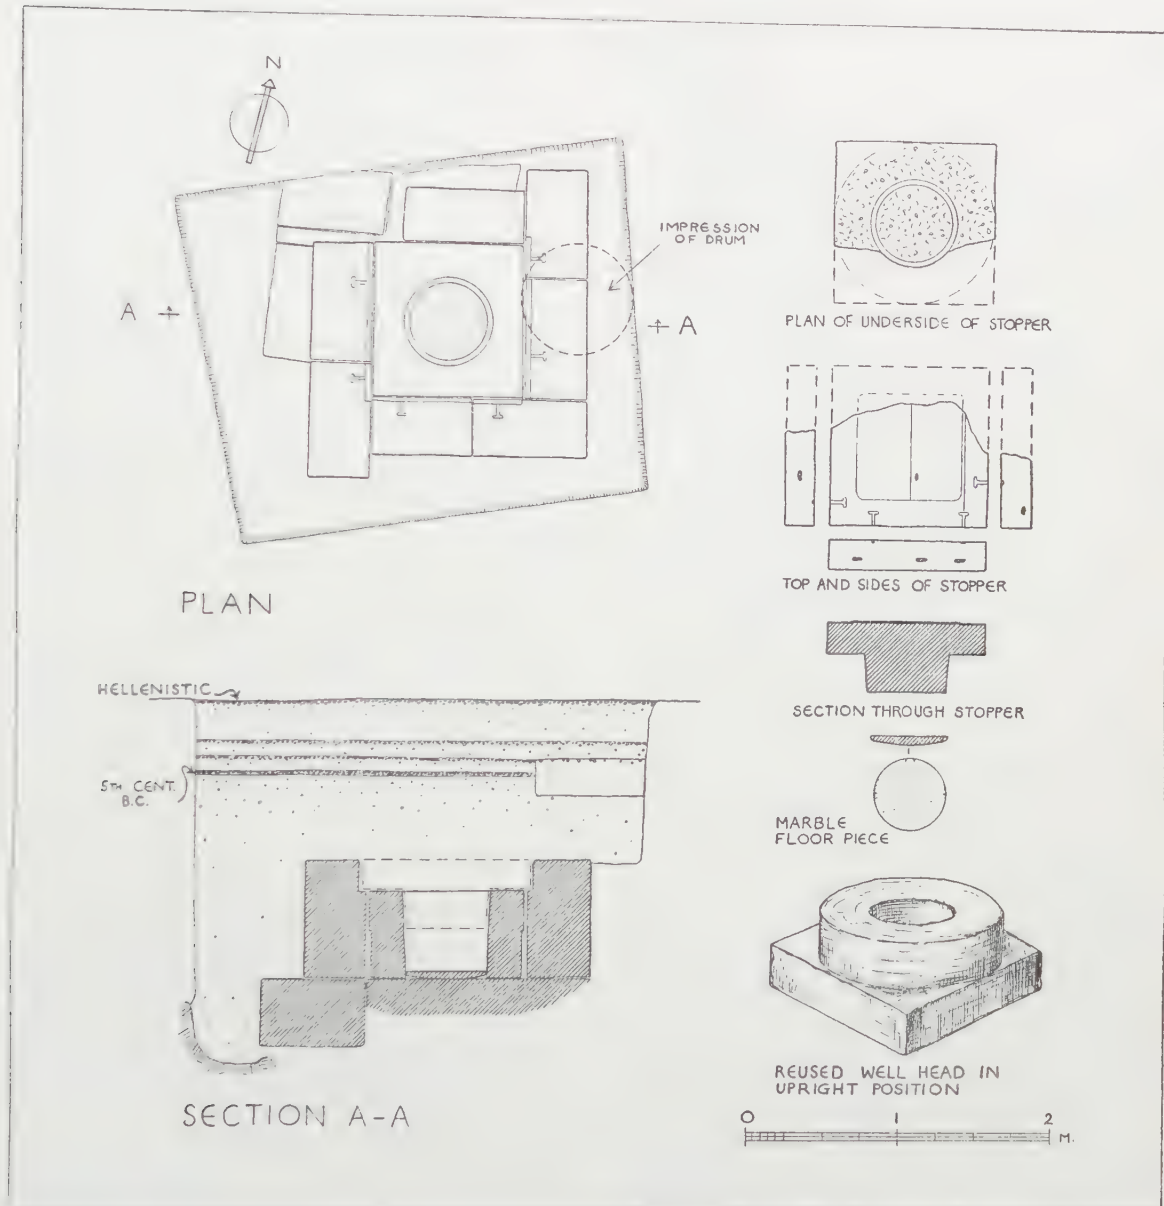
Stone-curbed Pit to West of Panathenaic Way.
